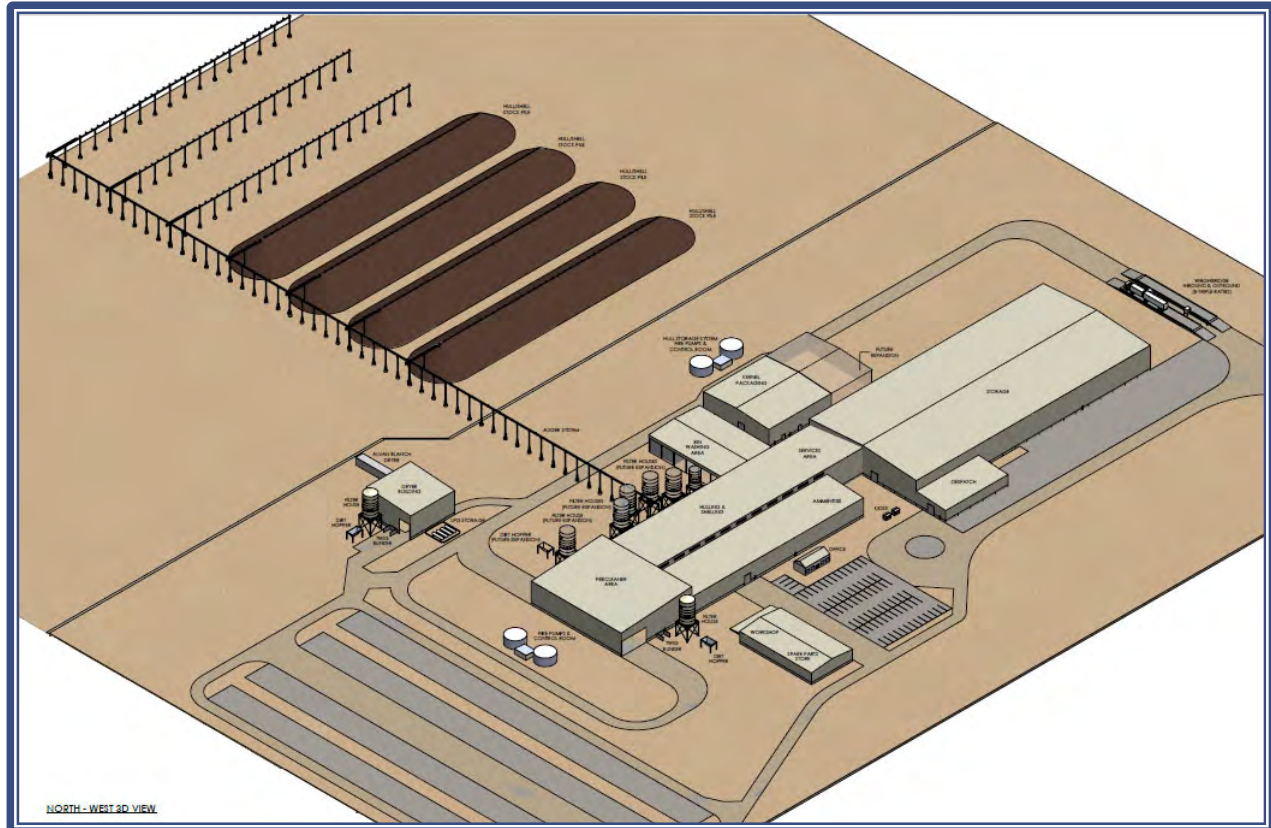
Overview of the project site and facility plans (Source: JMA Plans – Sheet A301)
